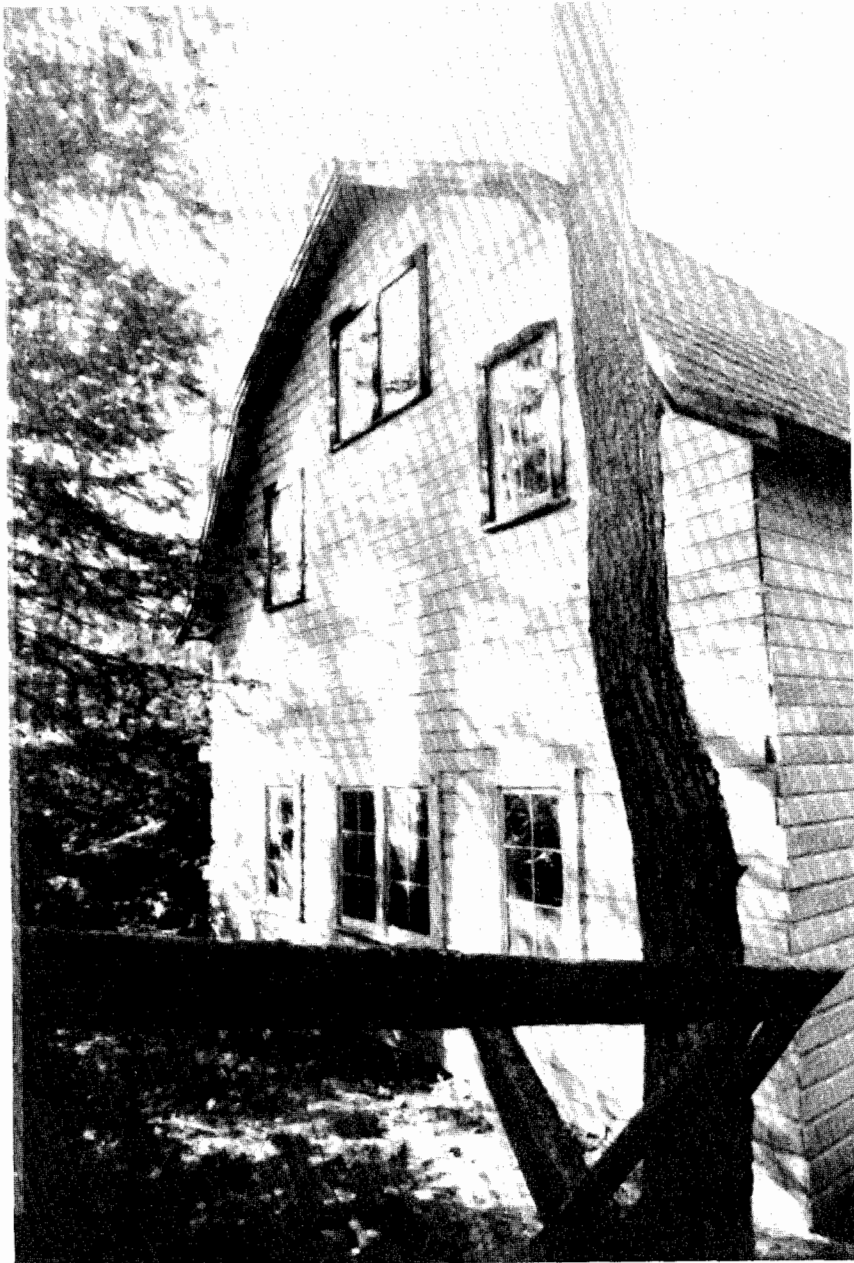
South Wall of the Twine Shed (HS-01-138F) September 1978. Note the generous placement of windows both on ground level and loft.
